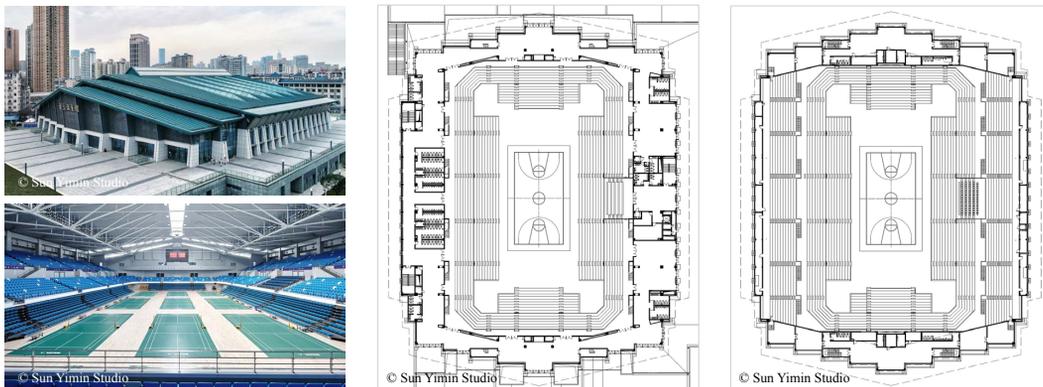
Wuhan University gymnasium and the floor plans (revised from Yang et al., 2018)
